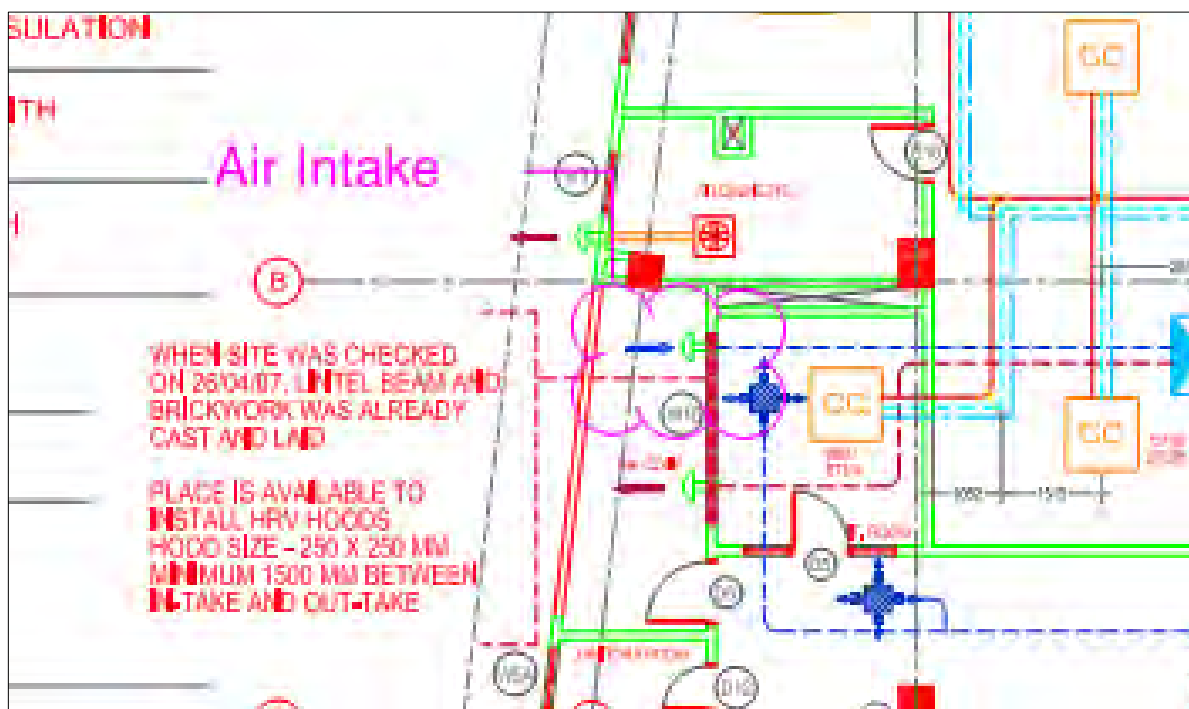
Building plan showing one of the air intakes at the Velaanaage building
